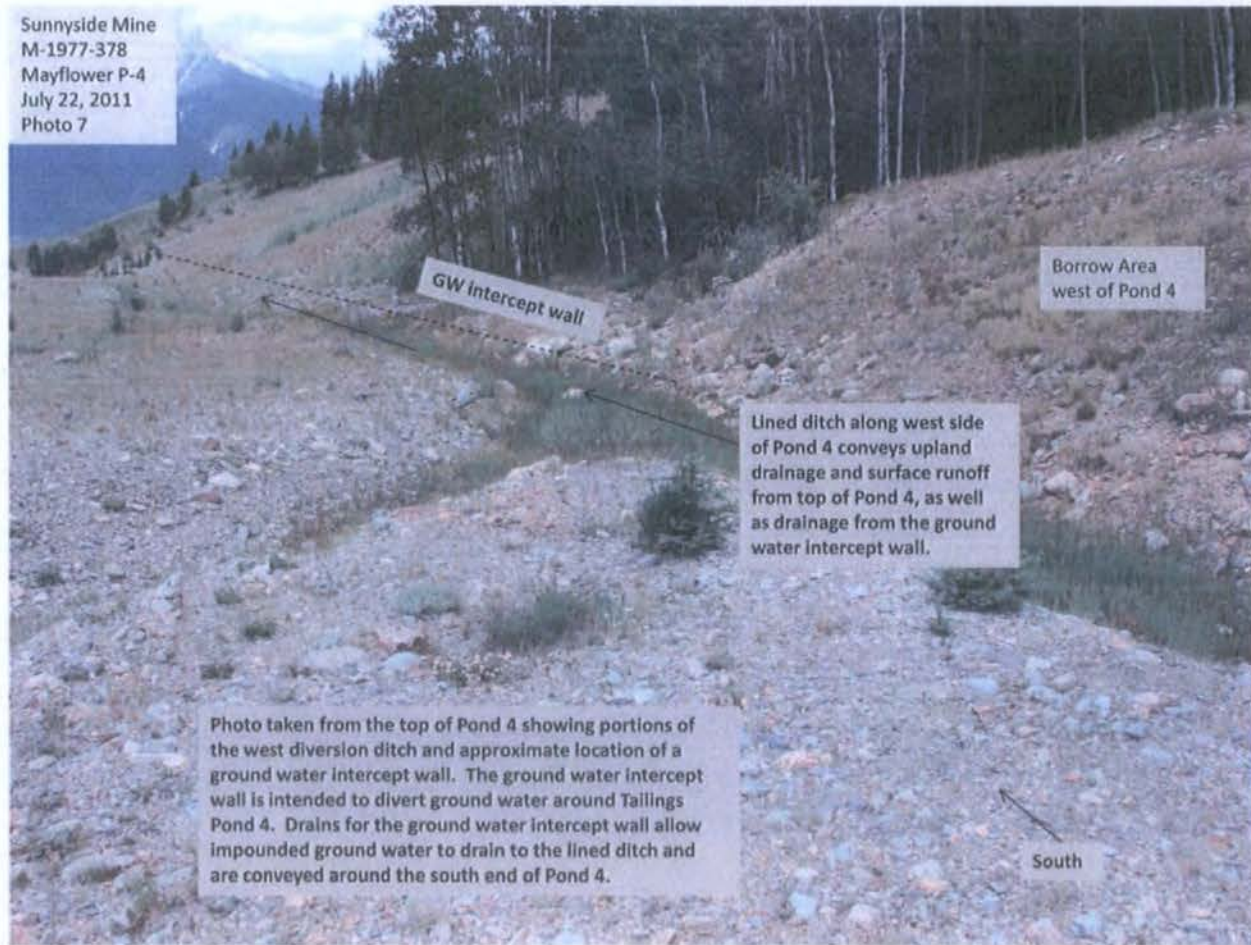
July 2011 DRMS Mayflower Mill Site Inspection Tailings Pond No. 4 – Intercept Wall (DRMS-039)
